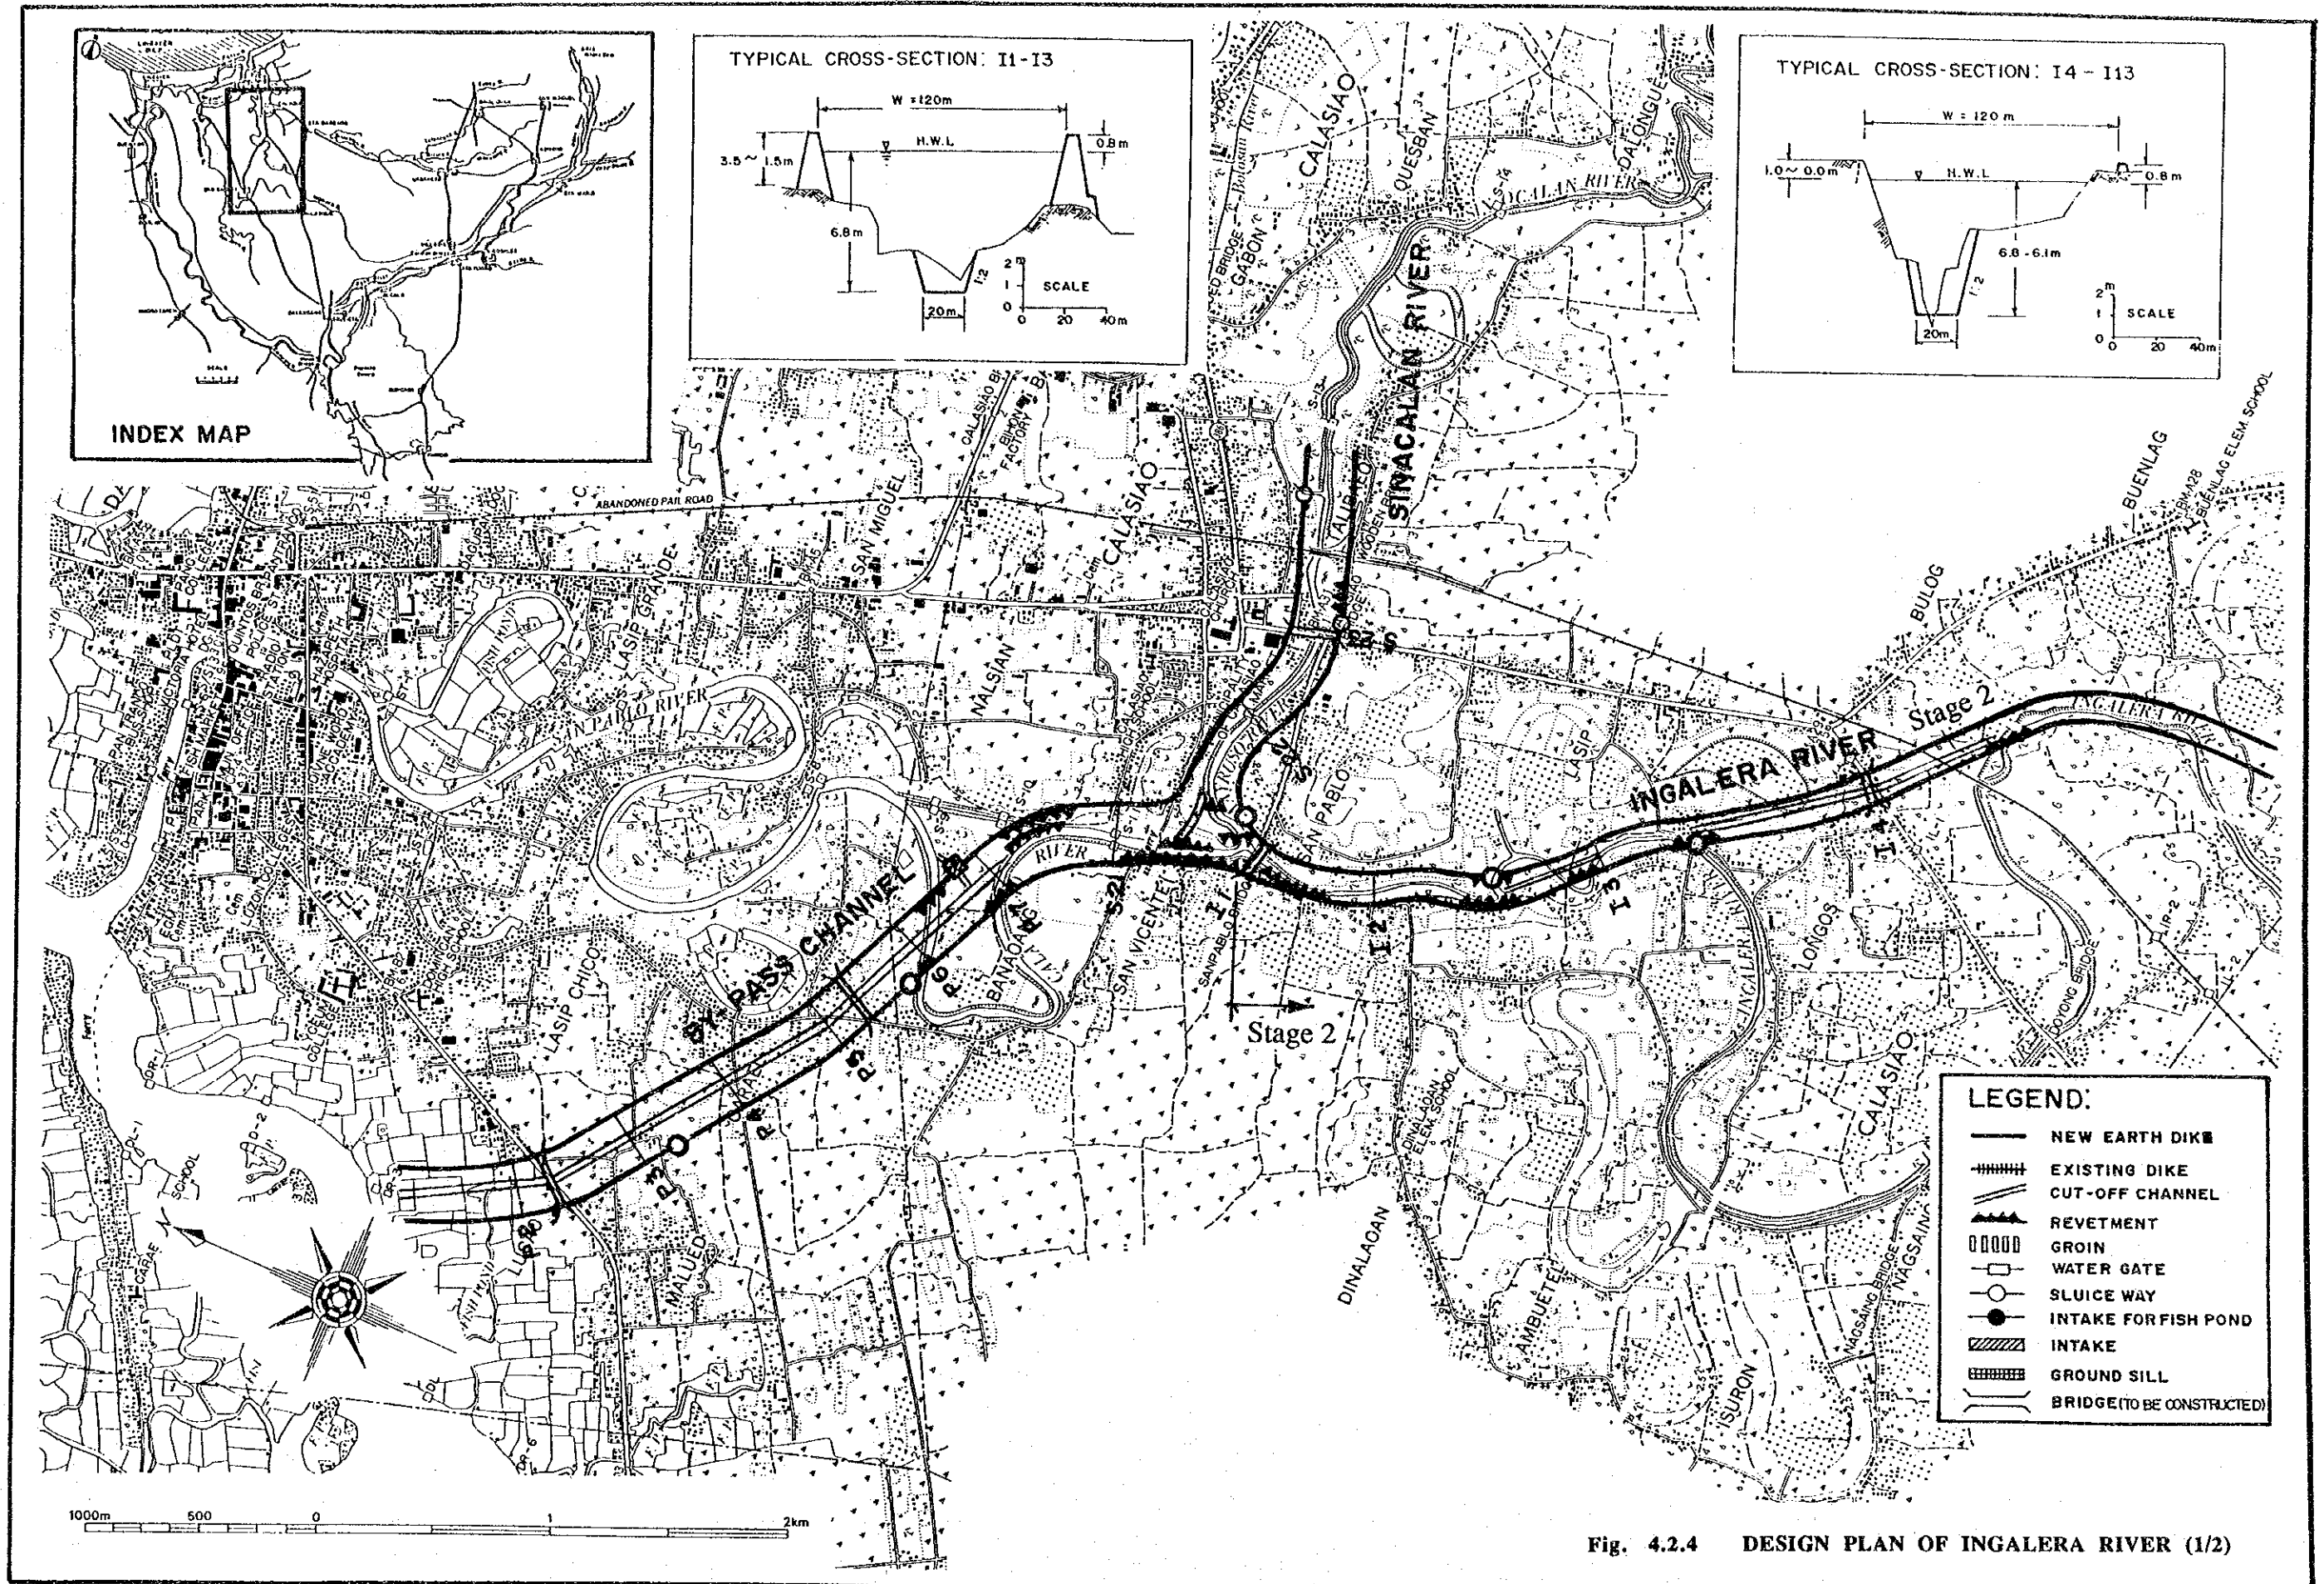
DESIGN PLAN OF INGALERA RIVER (1/2)
